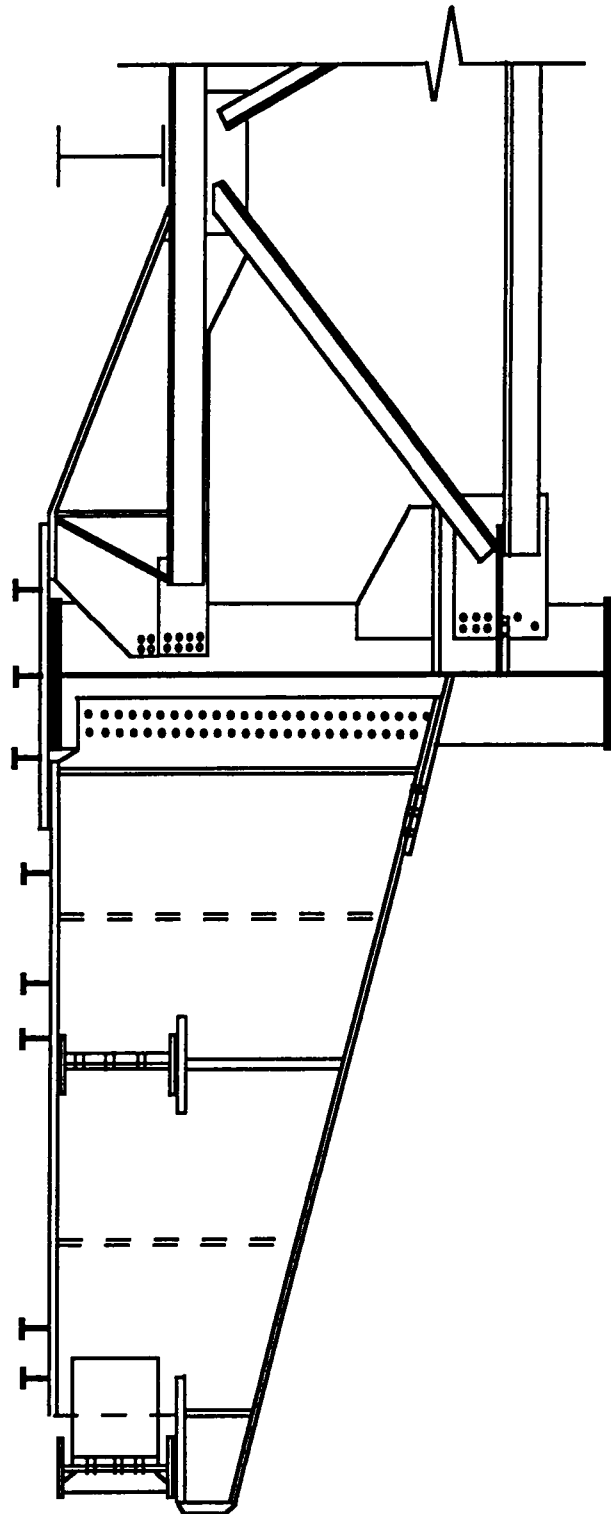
Cantilever to girder Connection Prior to Retrofit
